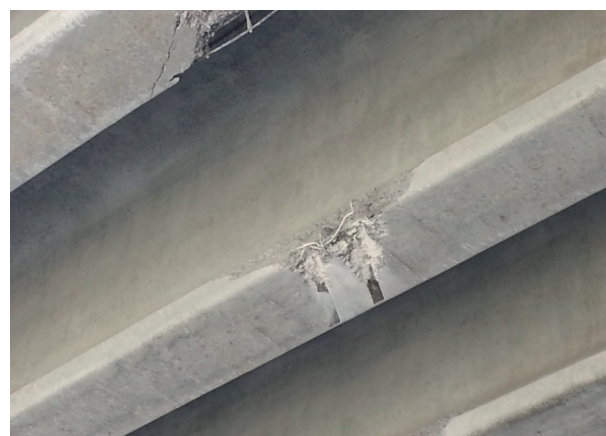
Destruction of the widened lower part of beam No. 3 from the Kapshagai side (Smooth and periodic profile reinforcement was torn. A longitudinal crack was revealed in the upper part of the beam rib of a length of about 9.2 m)
